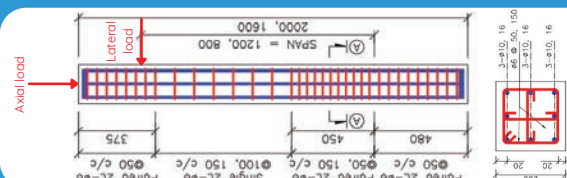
Exemplar column cross-section (Milap Dhakal, 2020)
